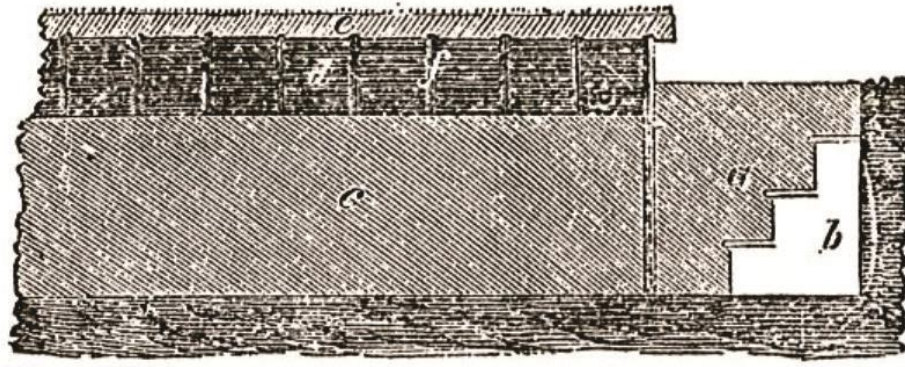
Cellar Profile a,b) steps; c) earthen wall; d) board roof; e) earth covering; f) rafters (Halsted 1977:228).
